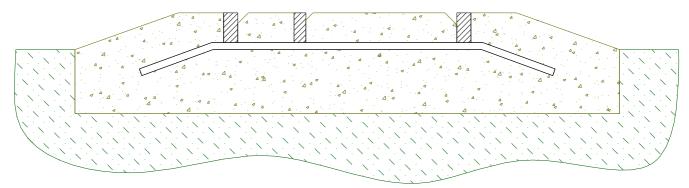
Cross-section of Concrete Encased 5" and 7 1/4" Gauge Miniature Railway Track Bed
